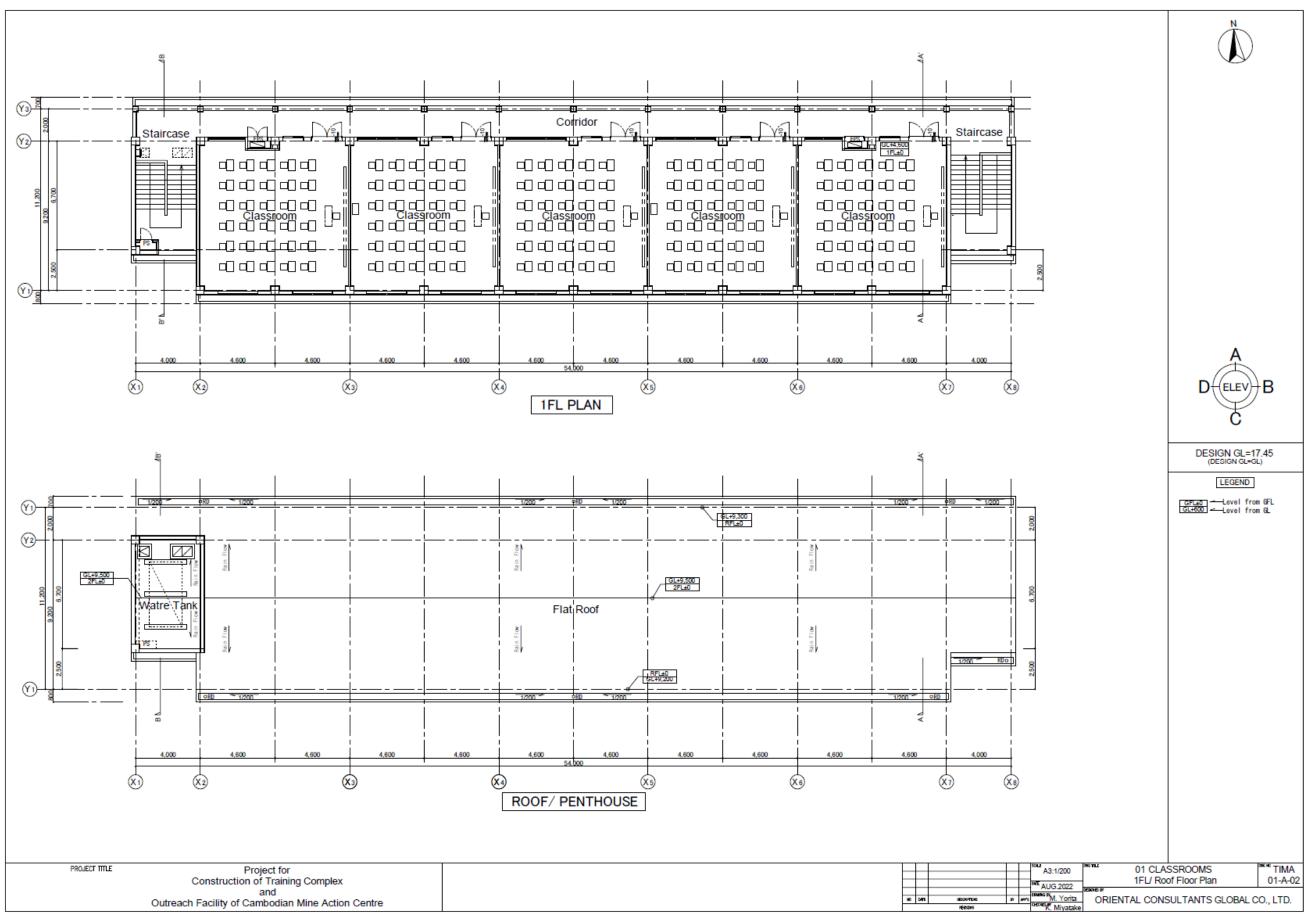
Floor Plan of TIMA Classroom Building (1FL, RFL)
